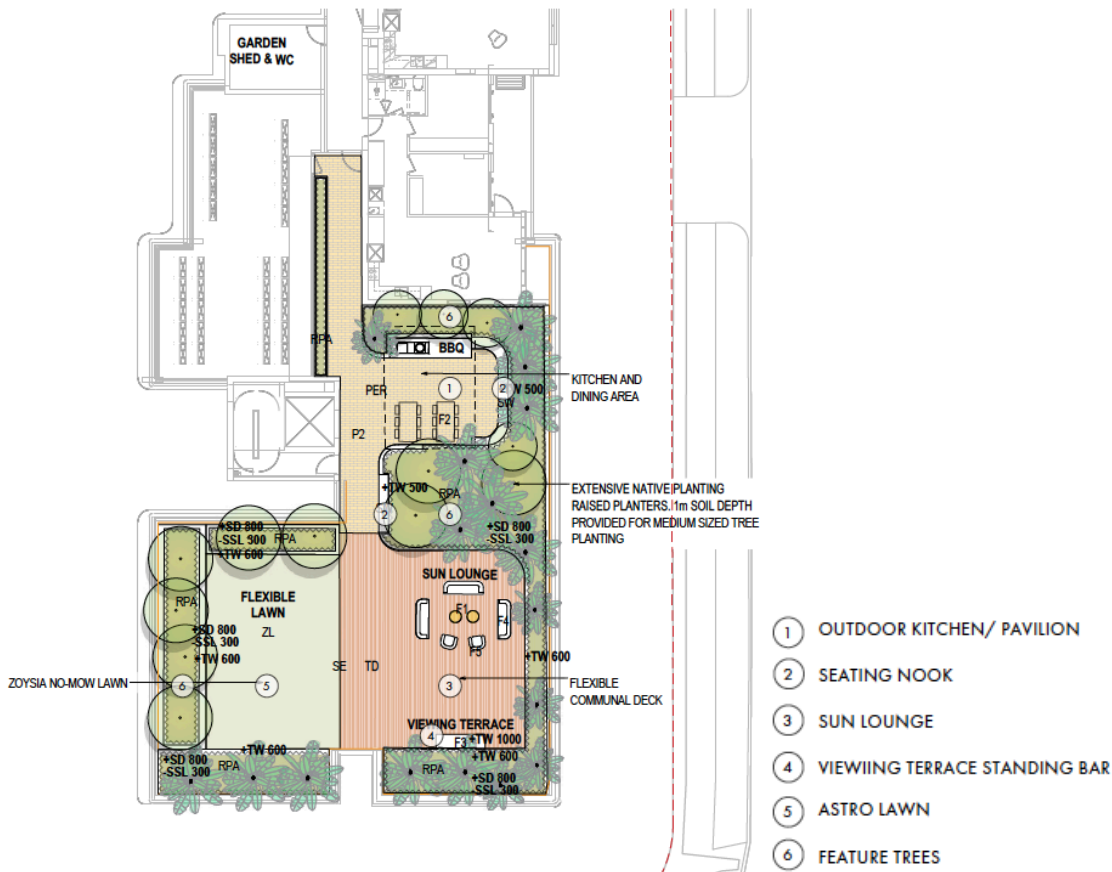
Level 3 communal open space plan (Source: Land and Form)
